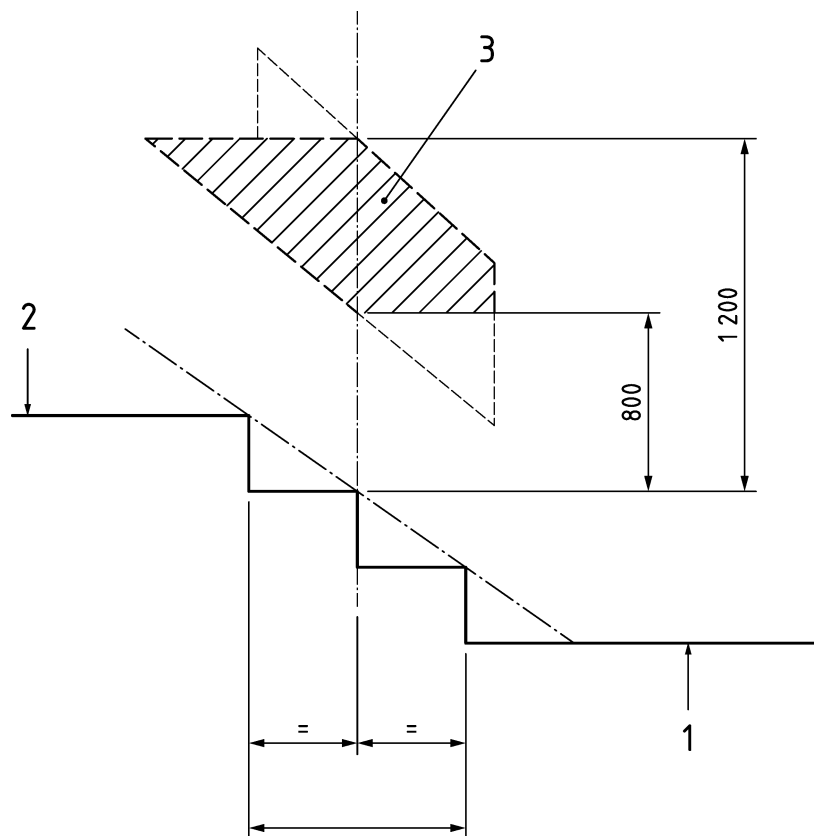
Examples of double hand rail for stairs of more than three steps
